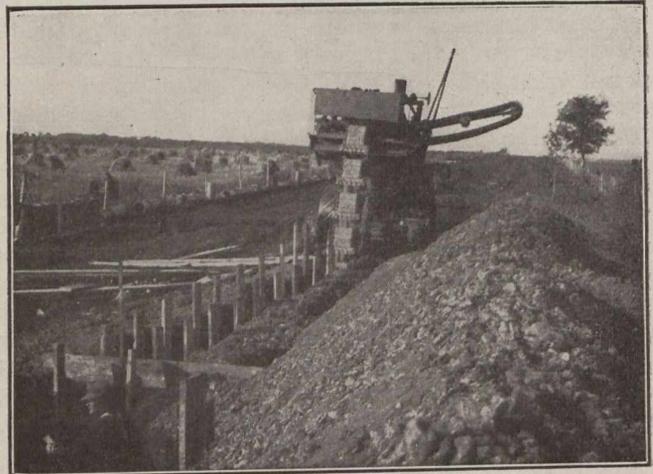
Excavating 20-ft. Trench from Town to Disposal Works.
